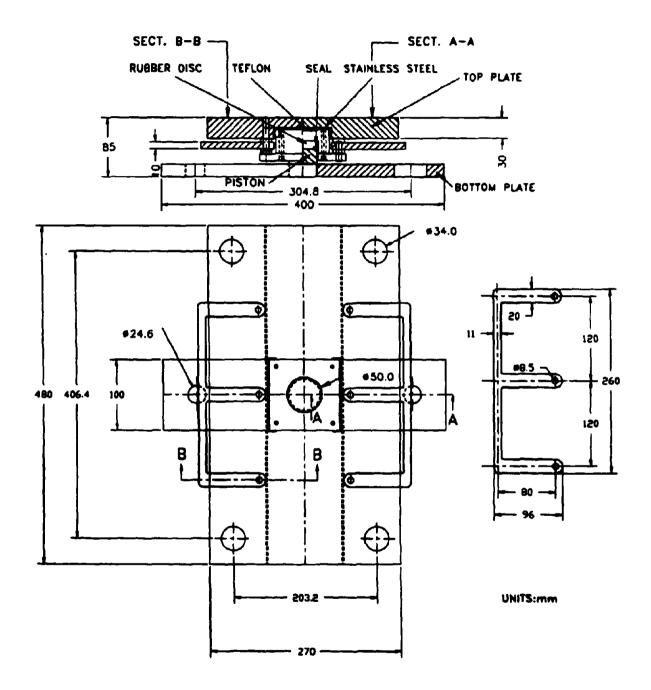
Design of Tested Bearing with E-shaped Dampers.
